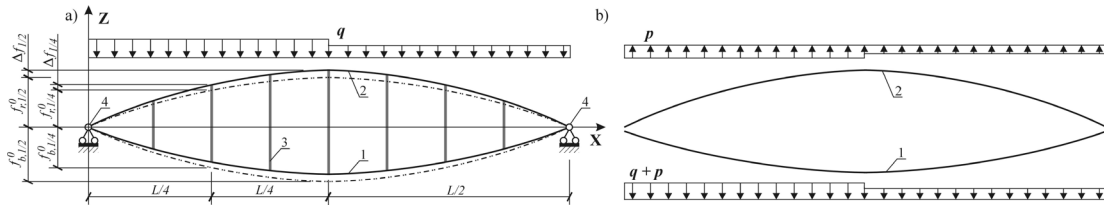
Two-chord cable truss. a – model of the structure; b – loads, acting on the chords; 1 – pre-stressed bearer chord; 2 – restraining chord; 3 – tie (spreader); 4 – fixed support
